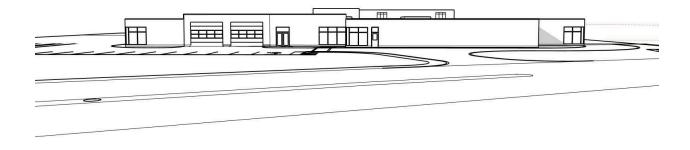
Building A Massing - Massing of East elevation facing Old Montreal Road. Building B can be seen peeking above from behind Building A
